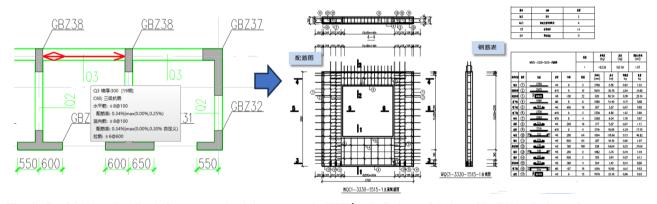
Prefabricated wall reinforcement obtaining process in YJK's built-in prefabricated building design software.
